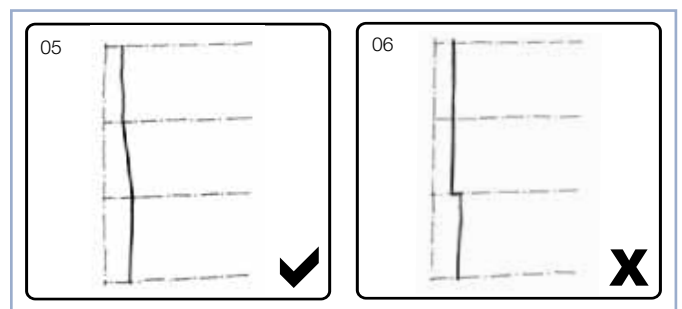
(f) Seawalls should mediate in plan between adjoining conditions. At no point should a seawall create a physical step in plan.(I)
